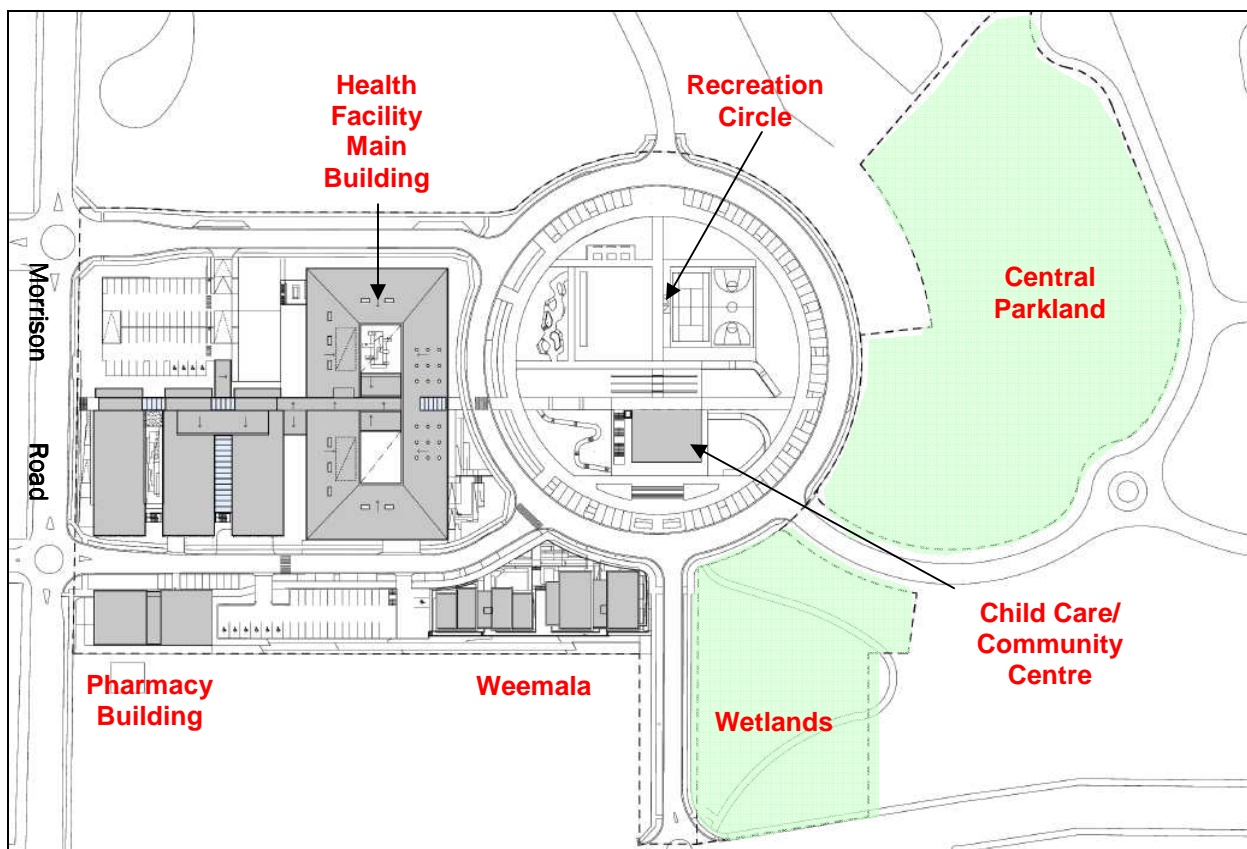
Approved layout of the Health Facility development (MP 08_0054)
